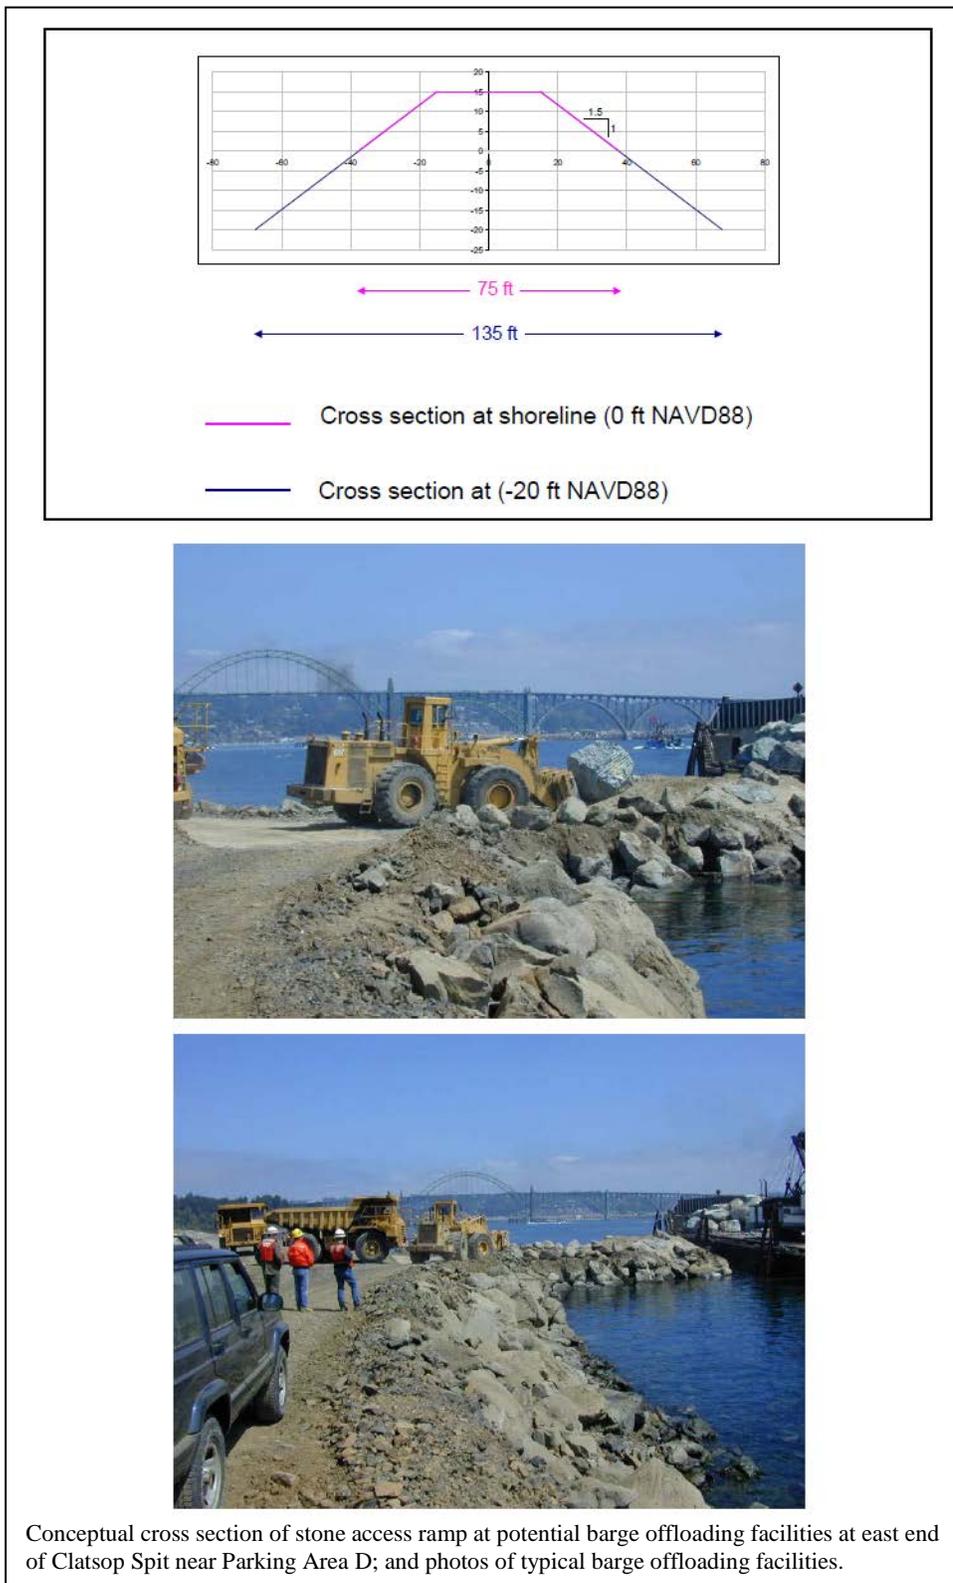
Conceptual Cross Section and View of Typical Barge Offloading Facility
